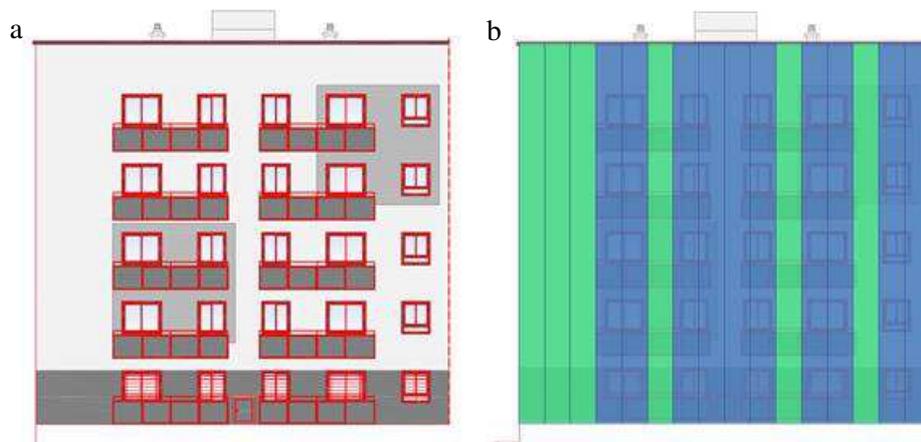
(a) Target block building located in Madrid; (b) Disposition of panels in the façade.
